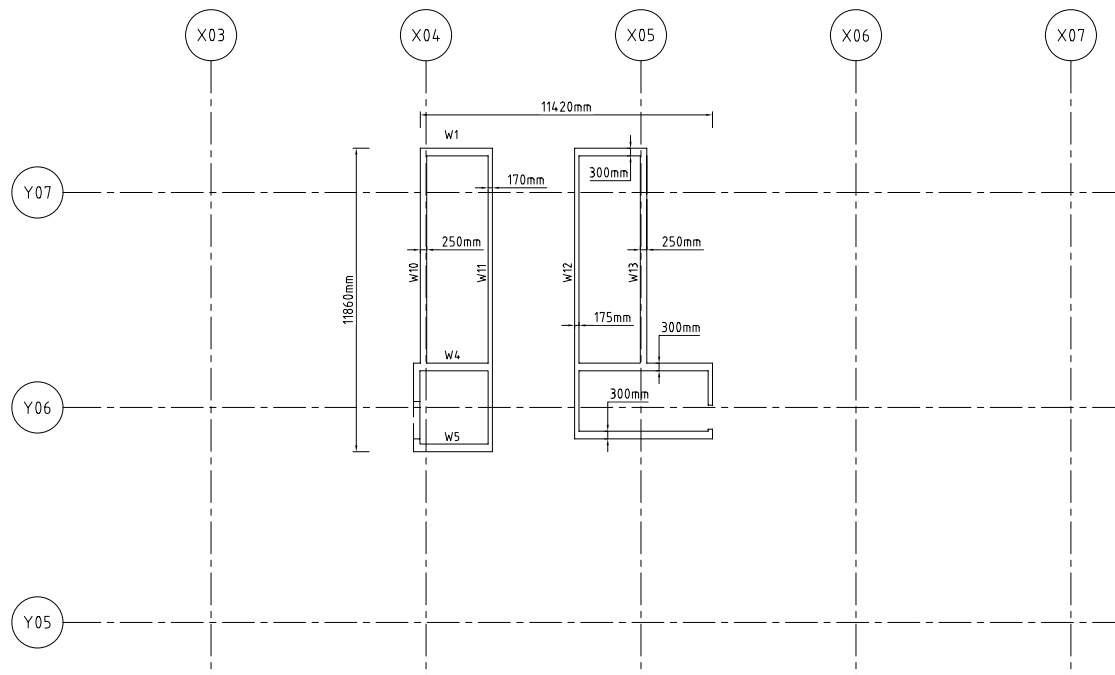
Level 53 Core Plan (Source: Hyder Consulting)
